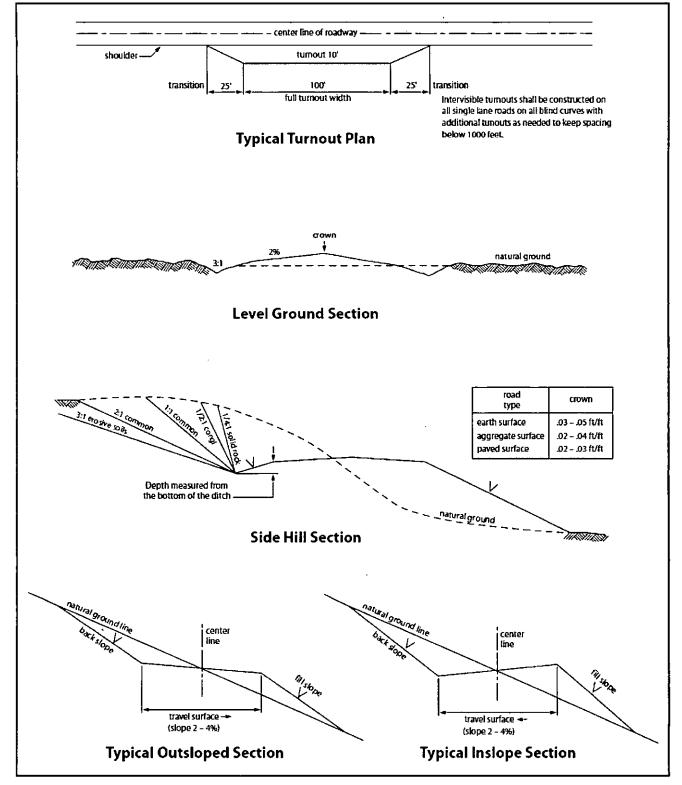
Cross-sections and plans for typical road sections representative of BLM resource or FS local and higher-class roads.
